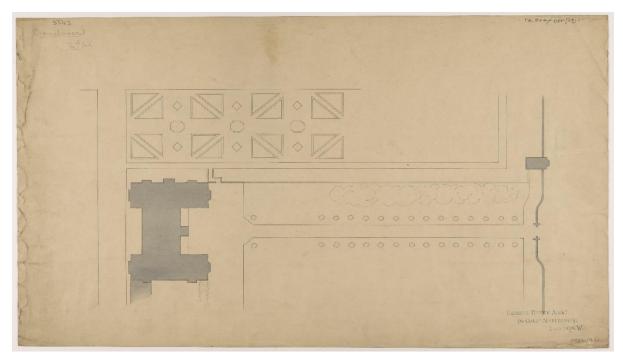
The formal plan of the parterre and driveway for Condover Hall. RIBA PB804, not dated.
